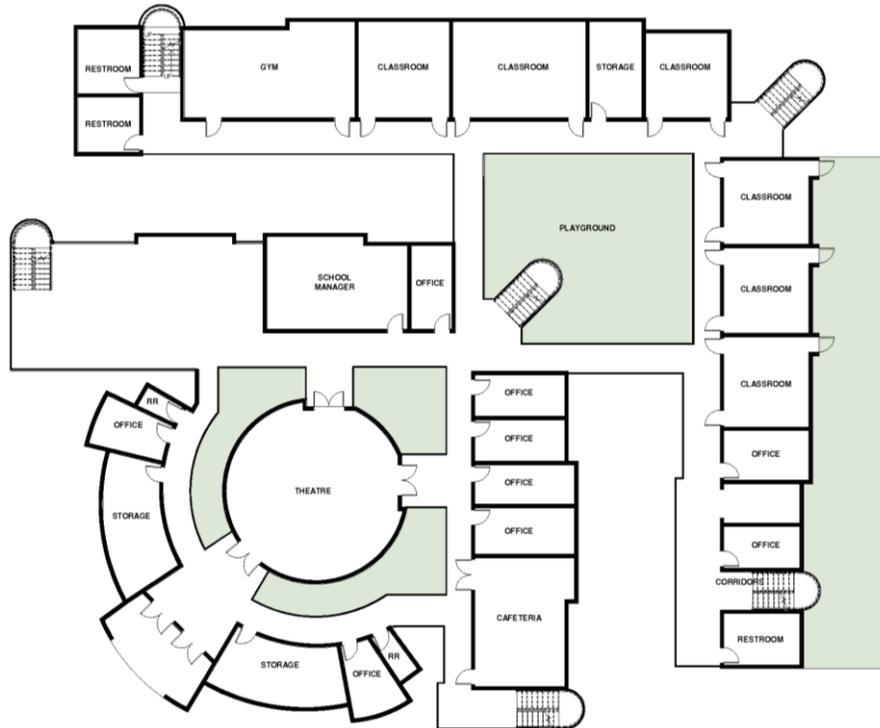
EJS main level floor plan (First Floor) – (Keshka, 2019) Digitally drawn by author.
